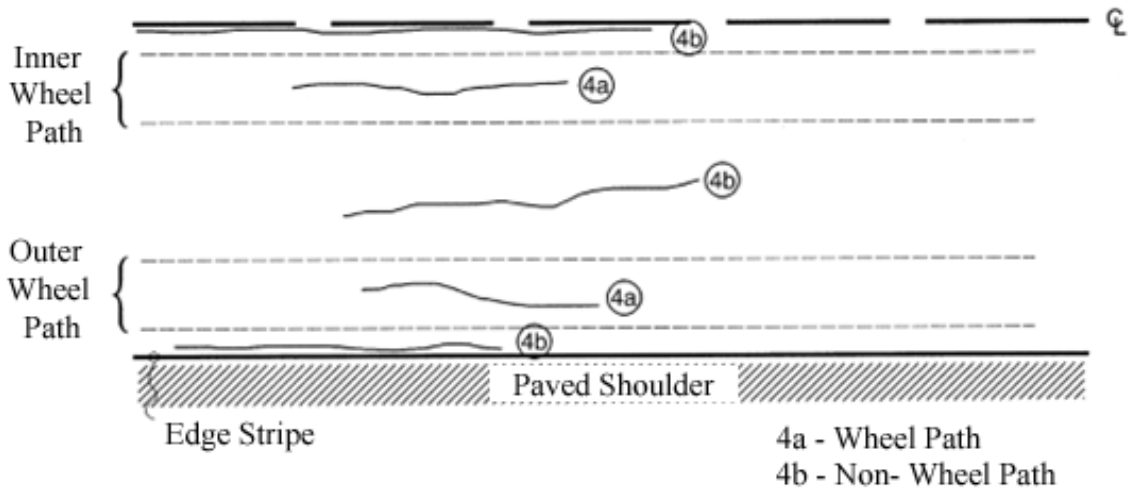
Longitudinal cracking cross-section (modified from Miller and Bellinger 2014)
